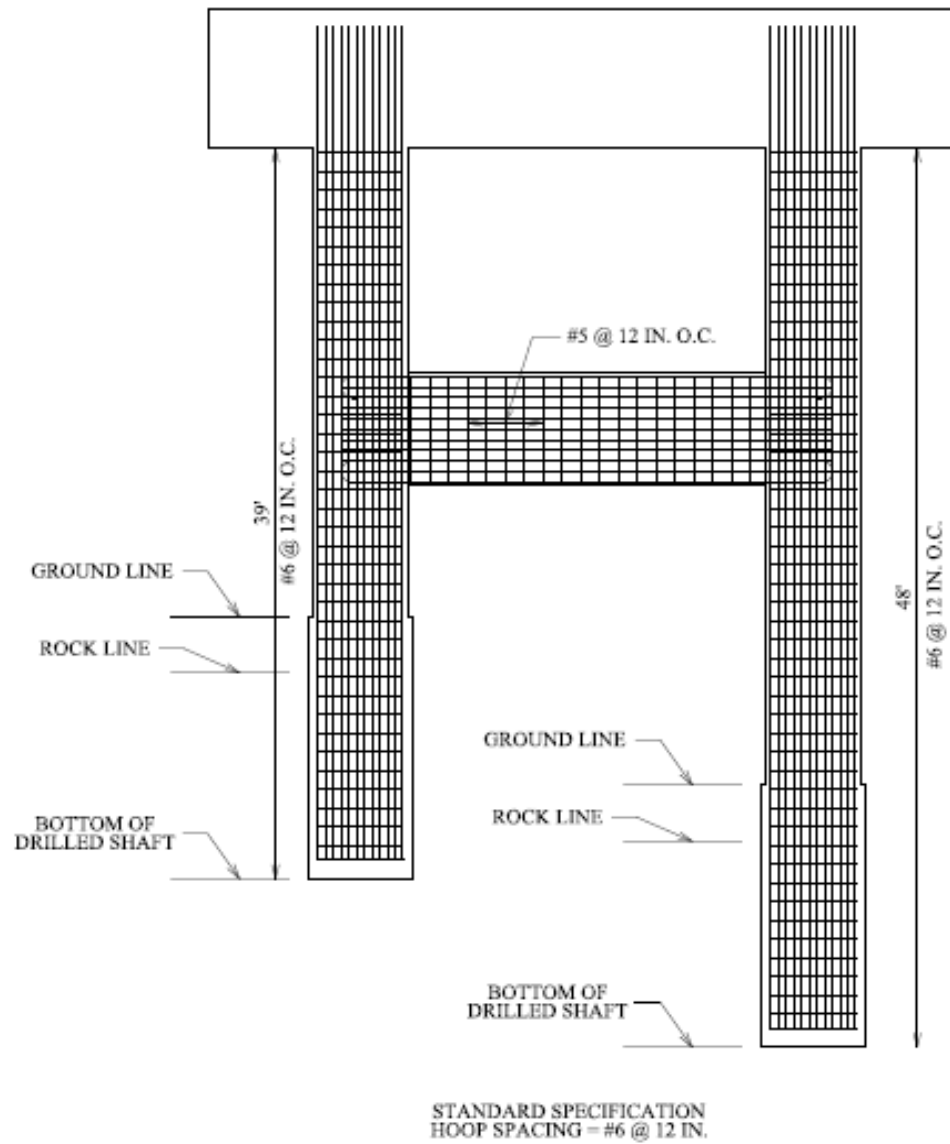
Scarham Creek Bridge Bent 2 Standard Specification
